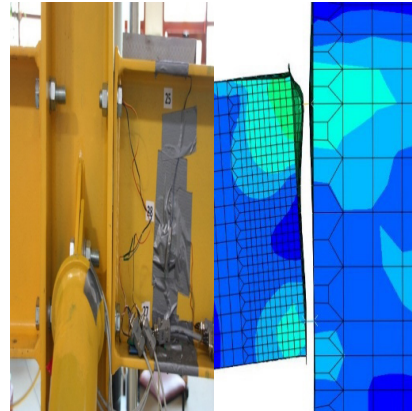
Deformed shape of steel joints with flush end-plates from test and FE joint, hogging moment
